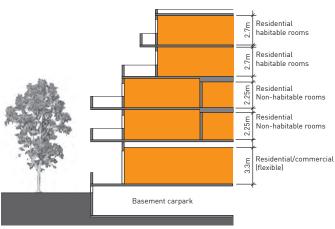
Typical section illustrating minimum ceiling heights.
